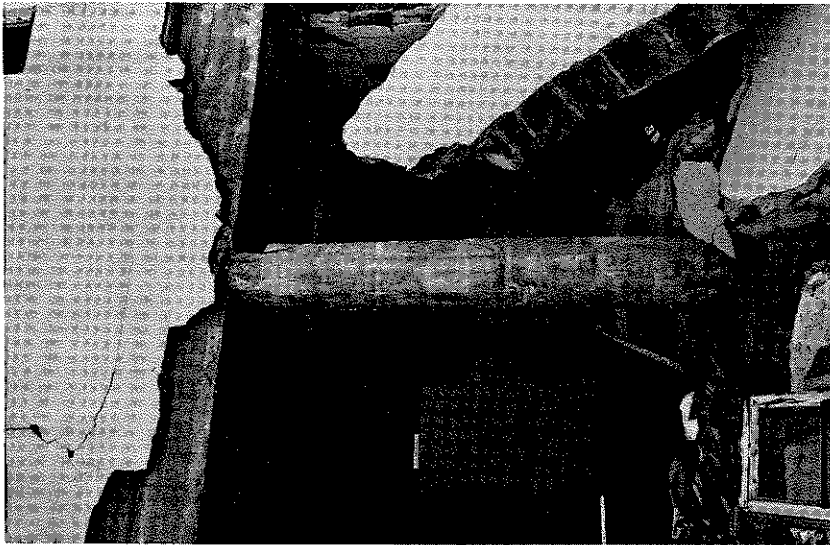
Damage to southeast end of the Mens' Ambulant Building; typical old construction. Note column-to-beam connections and portion of collapsed tile filler-wall. Veterans Hospital.
